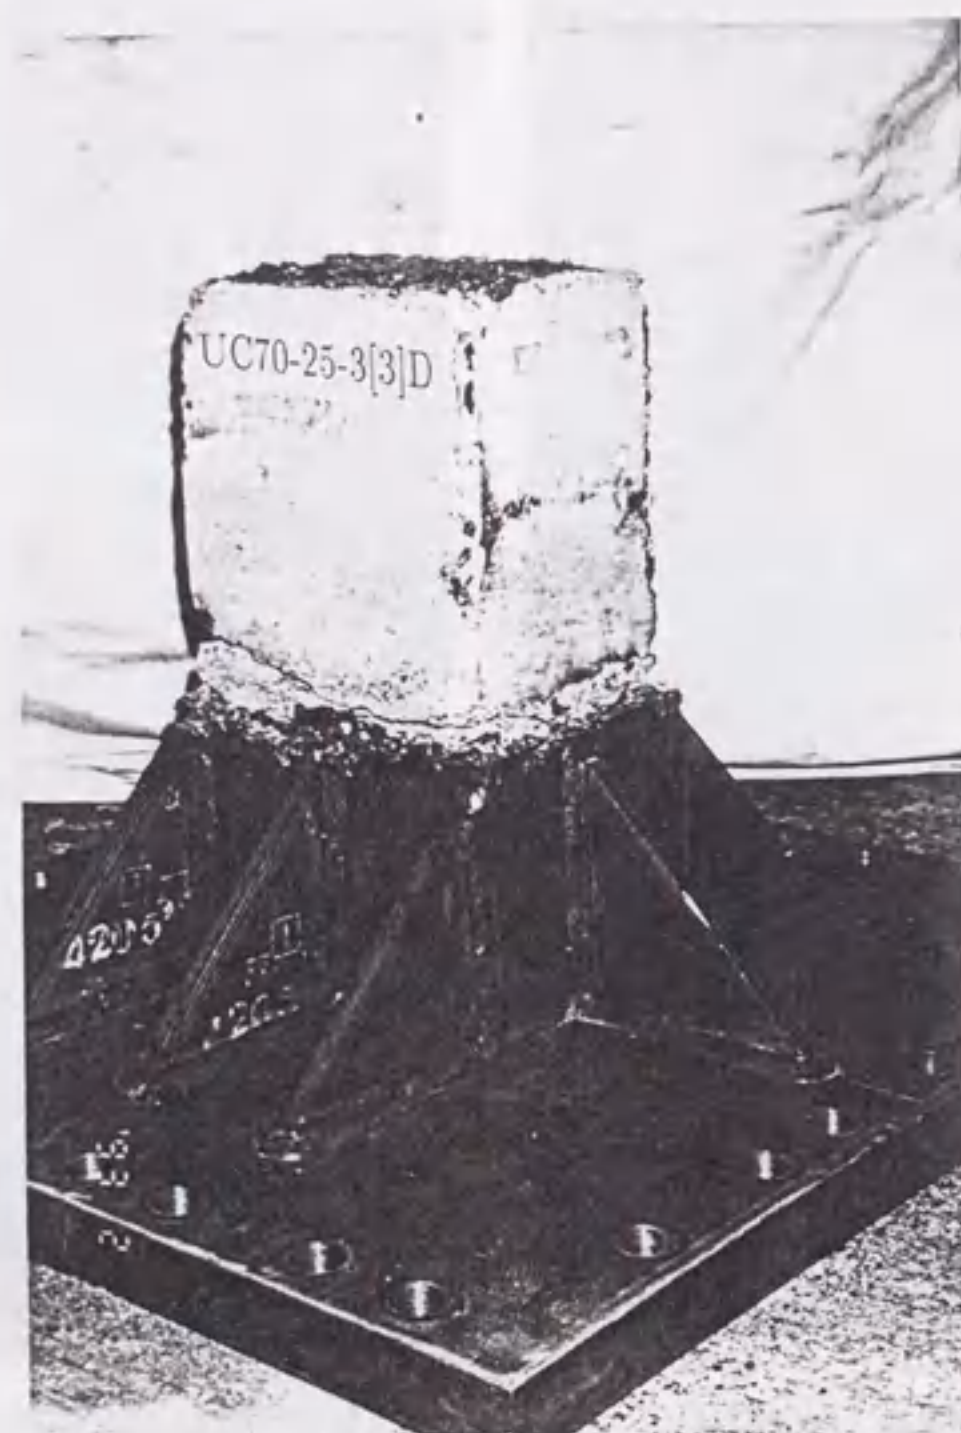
Filled-in Concrete in Specimen UC70-25-3[3]D after Test
